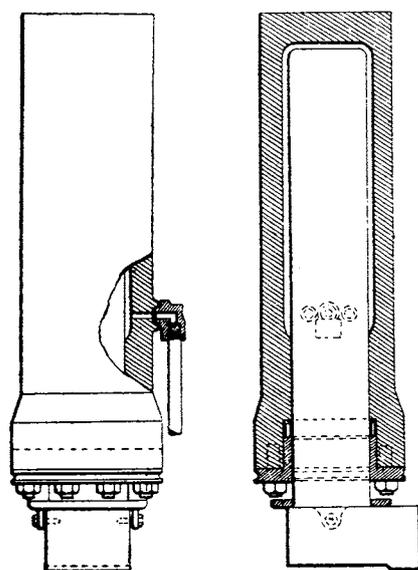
EAST RIVER TUNNEL, NEW YORK.
